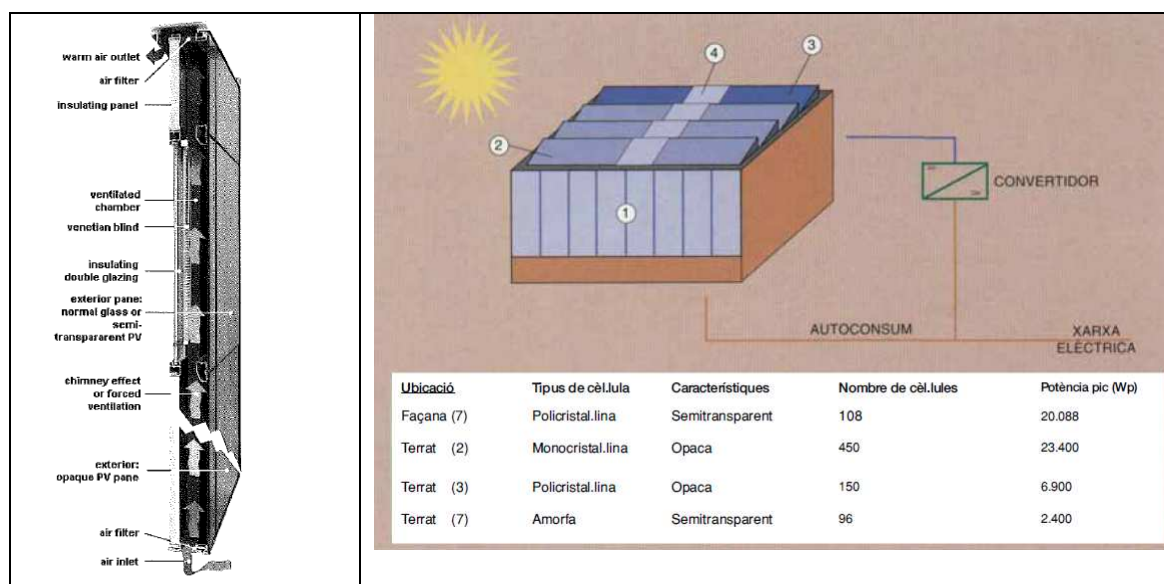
The public library of Mataró as an example of PV ventilated façade. Source: ICAEN.
